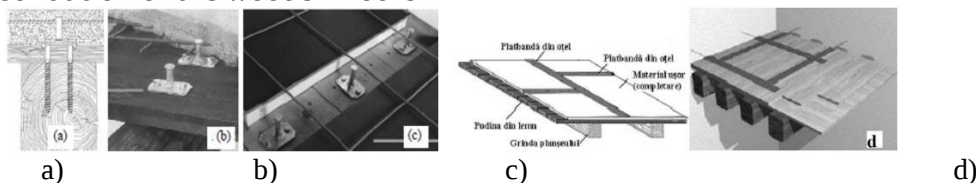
Consolidation of wooden floors - a) cross section of the floor; b) over-concrete executed directly on the wooden floor; c) over-concrete executed on a thermal insulation layer; d) Reinforcement of wooden floors with metal strips [1, 97]
